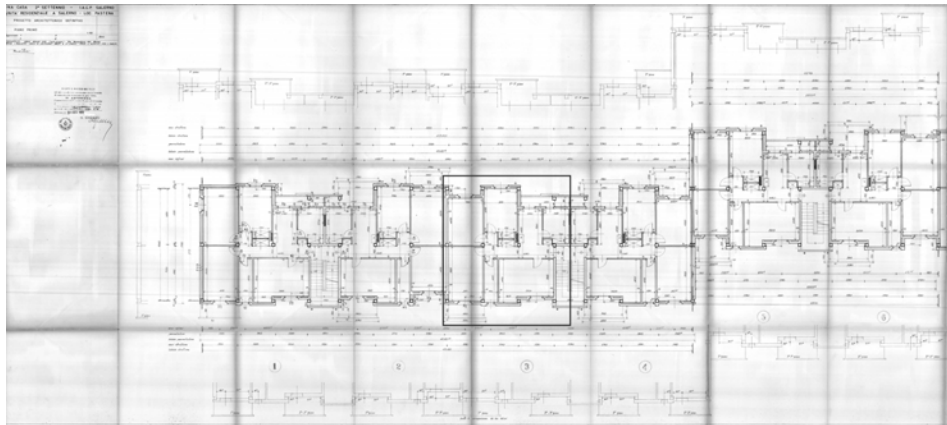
5: Quartiere Ina-Casa, Bruno Zevi-design documents- First floor plan.
